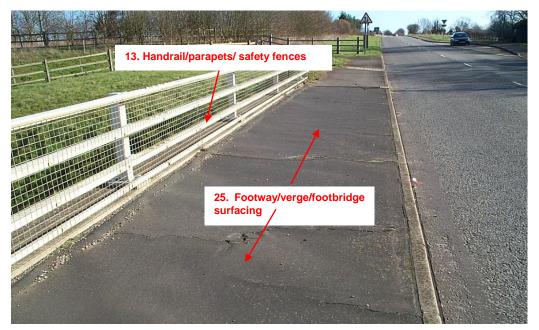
Thundery Hill Bridge – View Showing Hand Rails and Footway Surfacing
